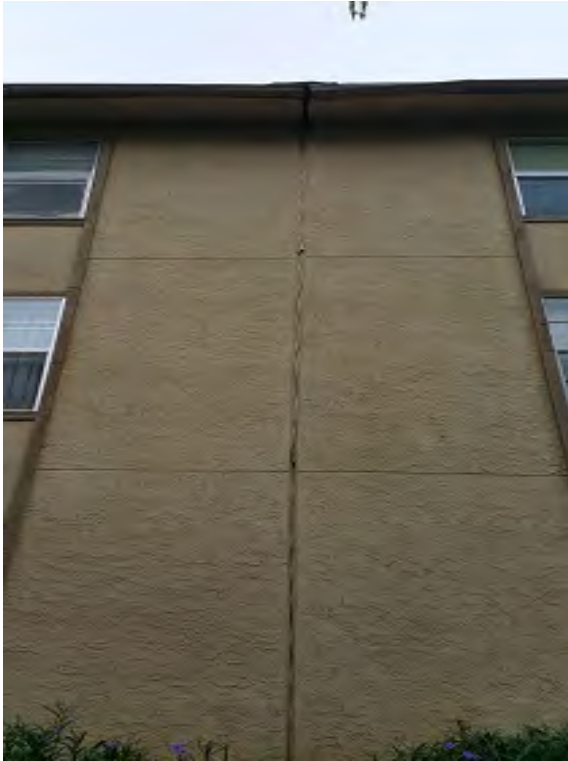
West Building: Deteriorated North Expansion Joint
